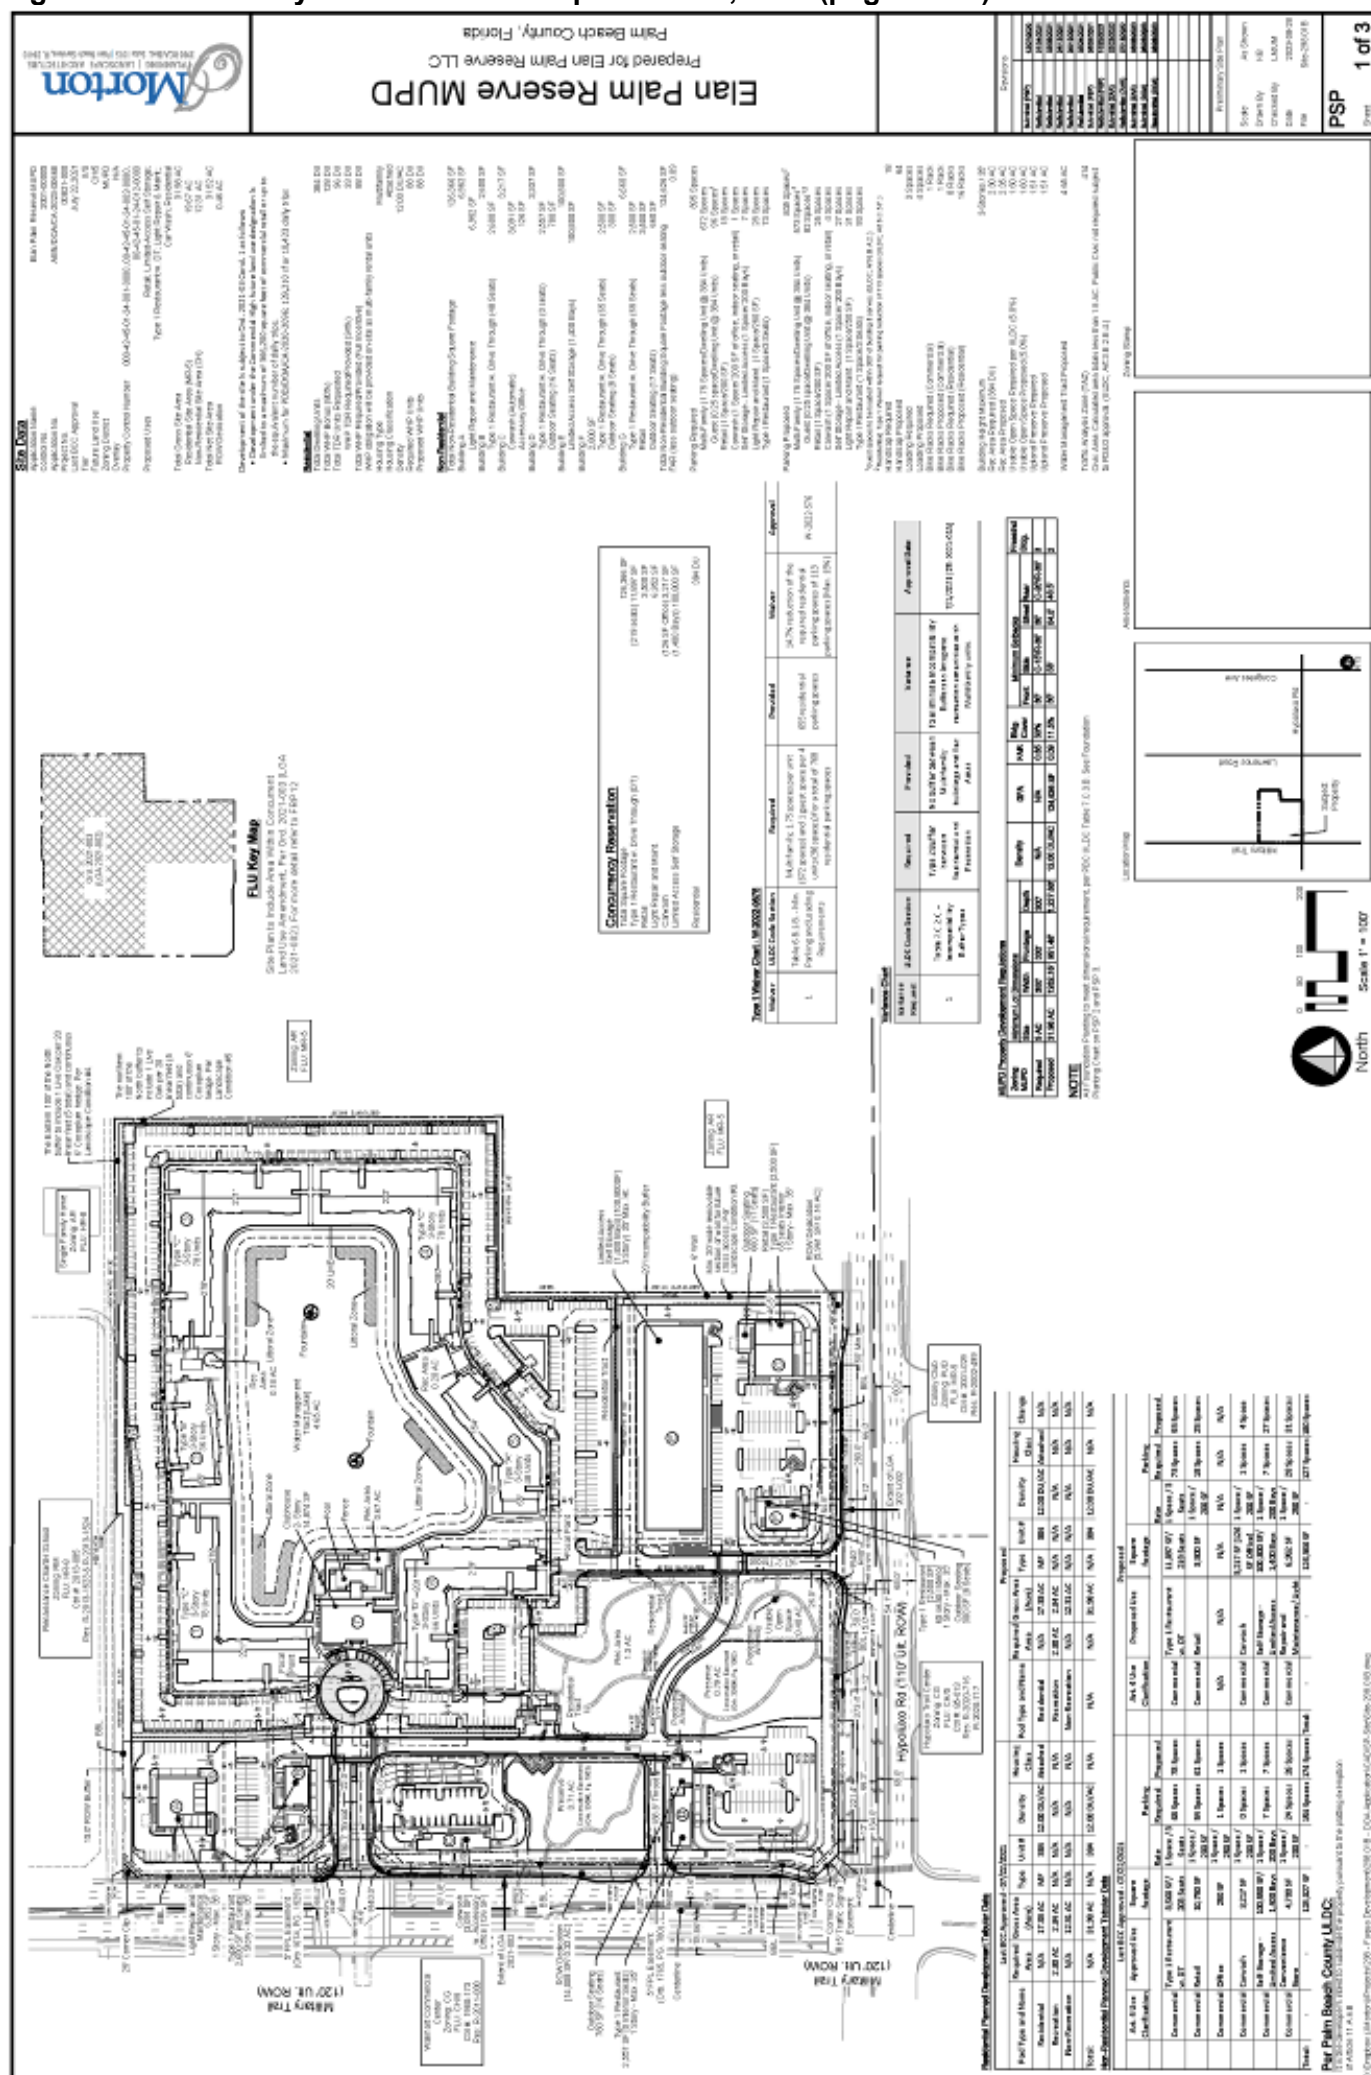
Preliminary Site Plan dated September 13, 2023 (page 2 of 3)
